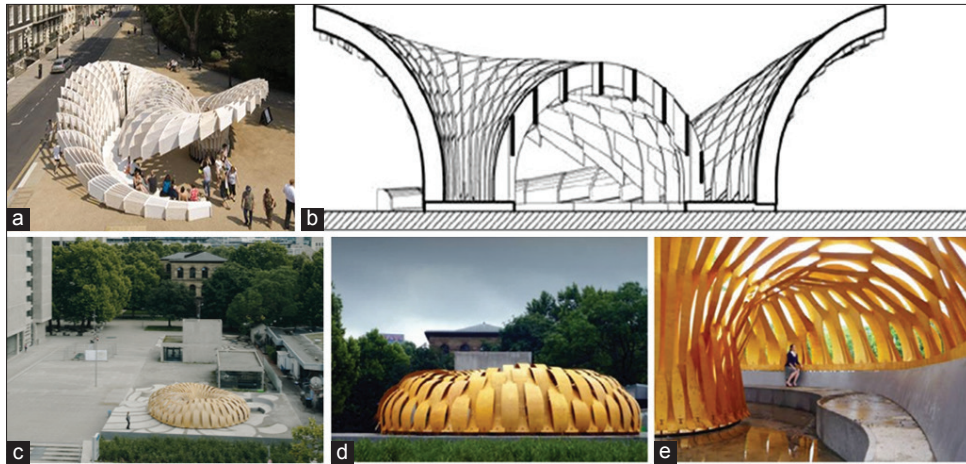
(a-e) Floor plan and section, made by plywood panels pavilions: Swoosh pavilion, Bedford Square, London, Valeria García Abarca, Charles Walker (professor), and Martin Self (professor, 154m²),^[34] General, exterior and interior structure, ICD/ITKE Research Pavilion 2010, Inst. for Computational Design (Prof. A. Menges), Inst. of Building Structures, and Structural Design (Prof. J. Knippers)^[35-37]
